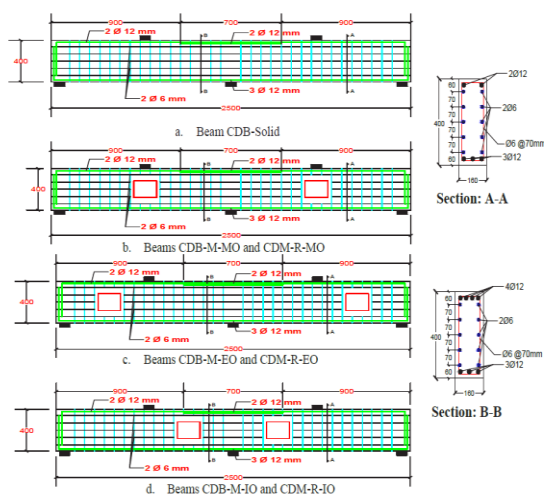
Details of steel reinforcement for typically tested beam (all dimensions are in mm)[52].
